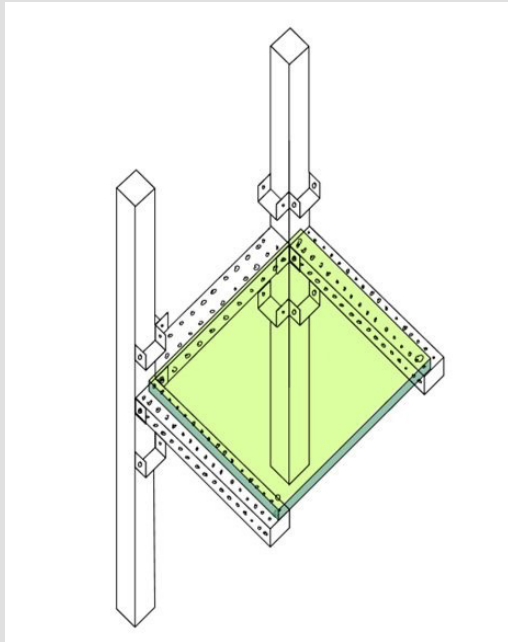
Early sketch showcasing fastening of the floor panels with the vertical and horizontal beams within the labyrinth.
